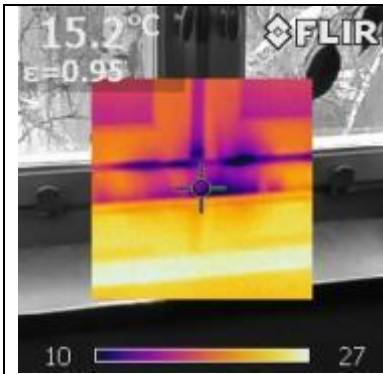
Leak trough crack in window frame and between window frame and arch.
